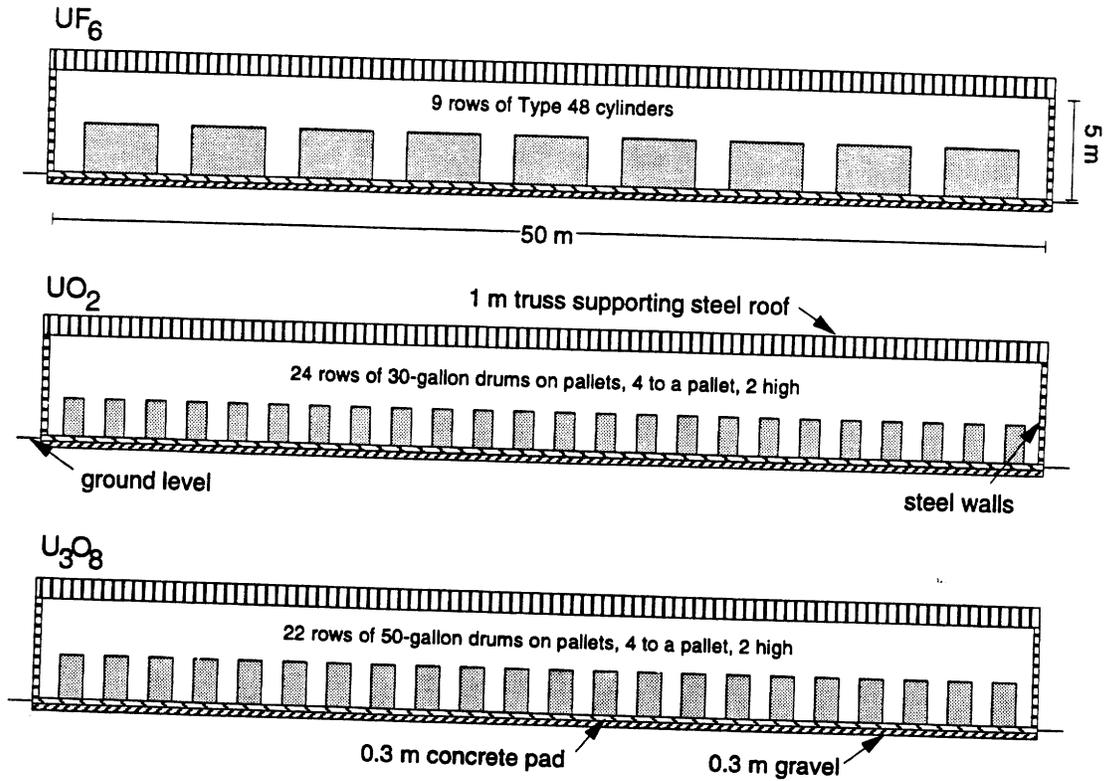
Elevation View of Storage Building Showing Storage Configurations
